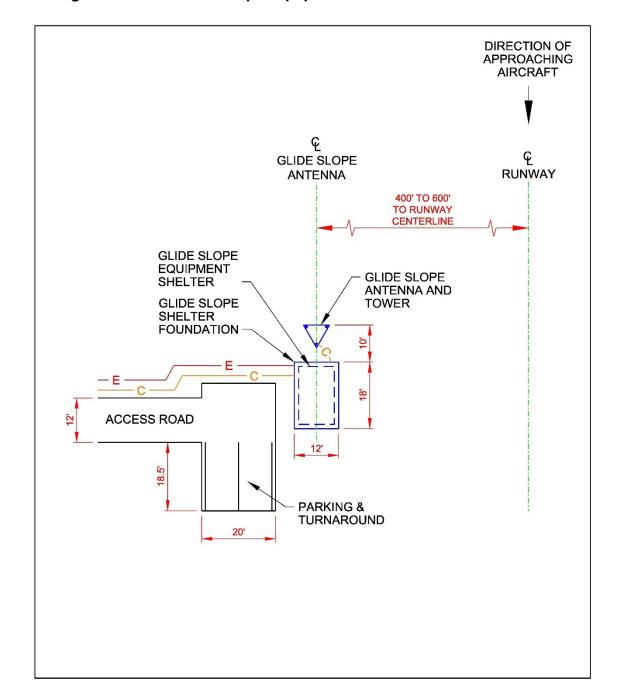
ILS Glide Slope Equipment and Antenna Site Plan
